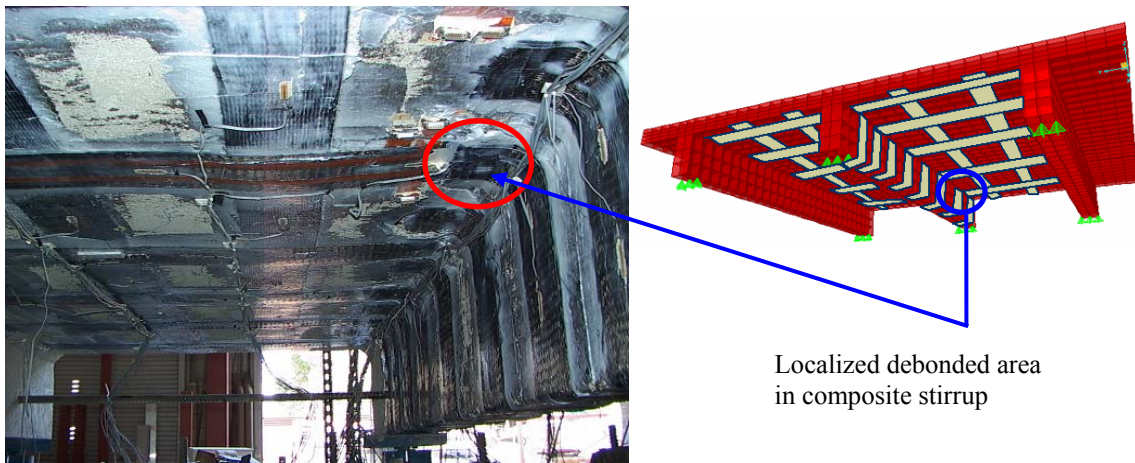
Damaged area in composite stirrup at end of test
